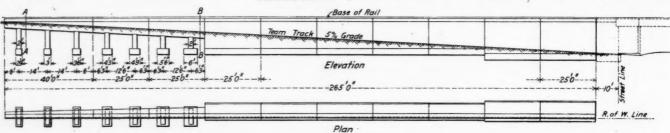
Retaining Wall Design; Evanston Track Elevation.
